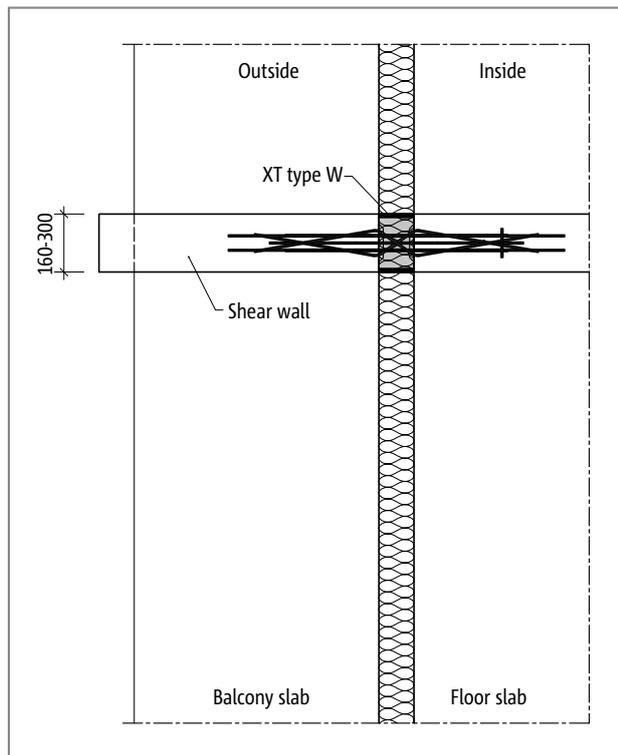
Schöck Isokorb® XT type W: Plan view; balcony construction with thermally insulated load-bearing shear walls
